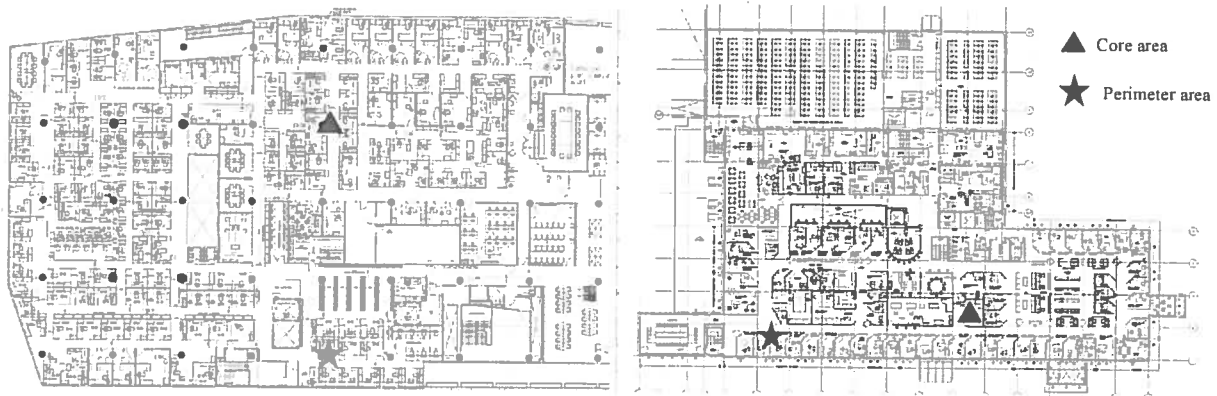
Monitored floor plans - Building B (left side) and in Building C (right side).
